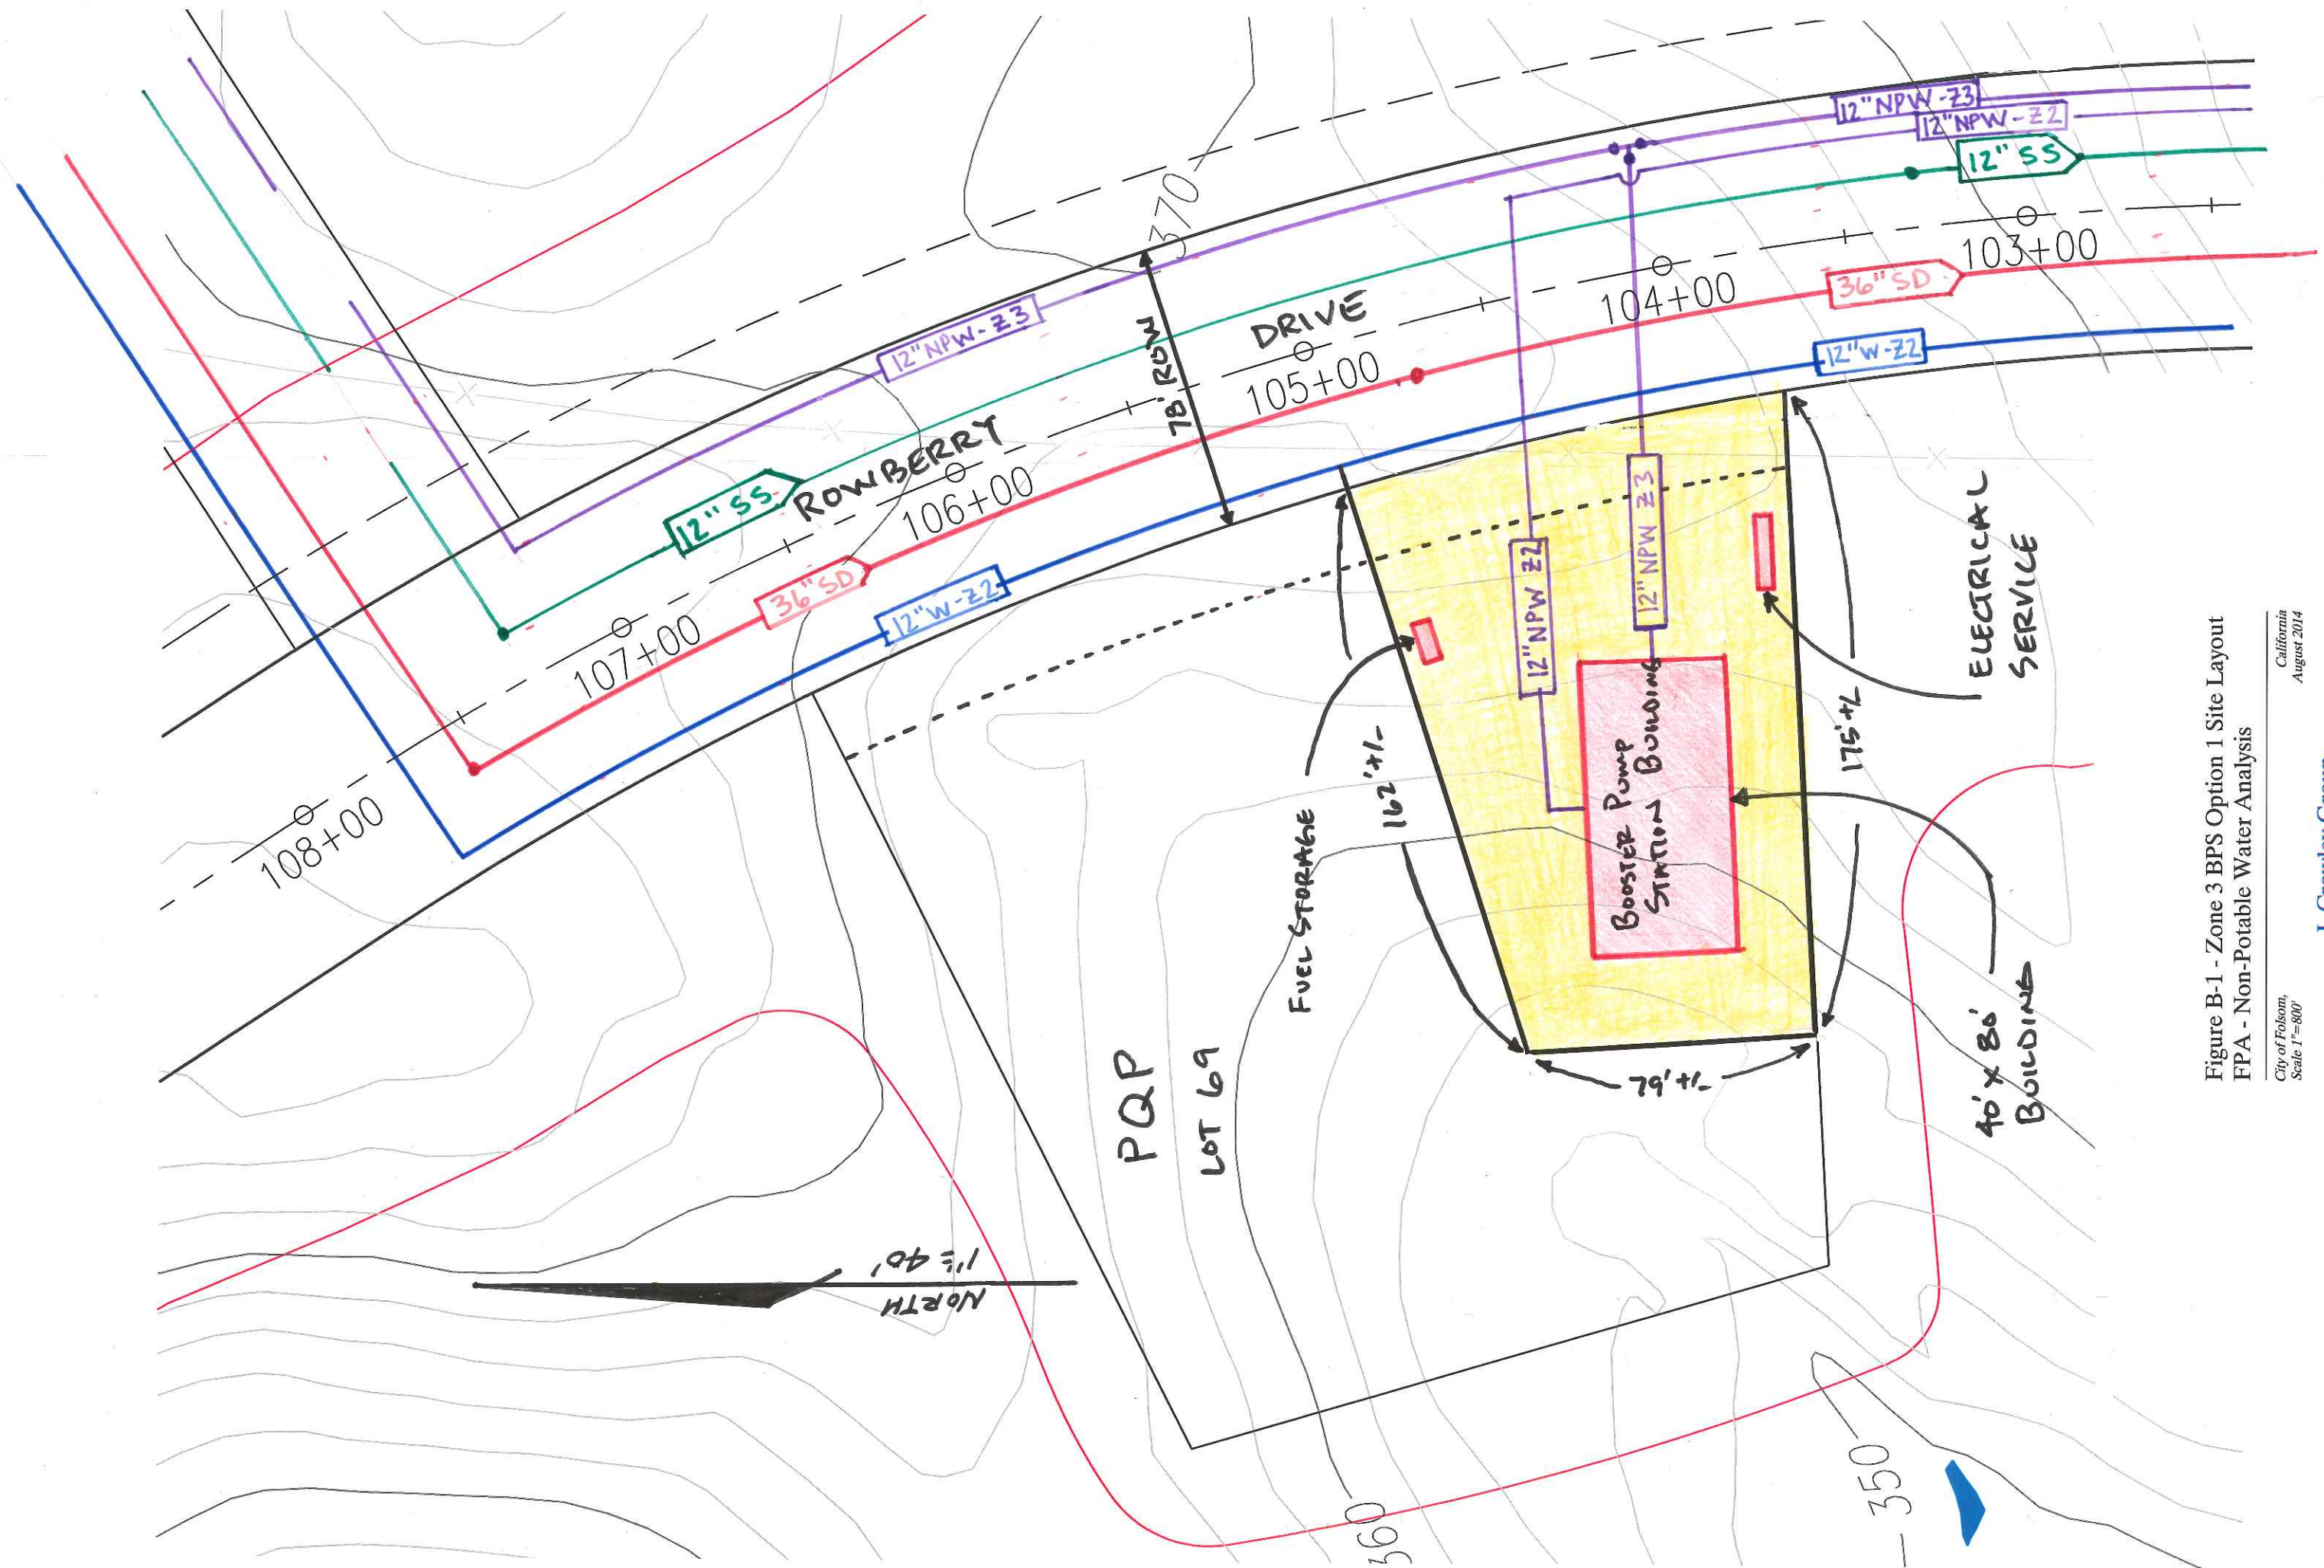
Zone 3 BPS Option 1 Site Layout
